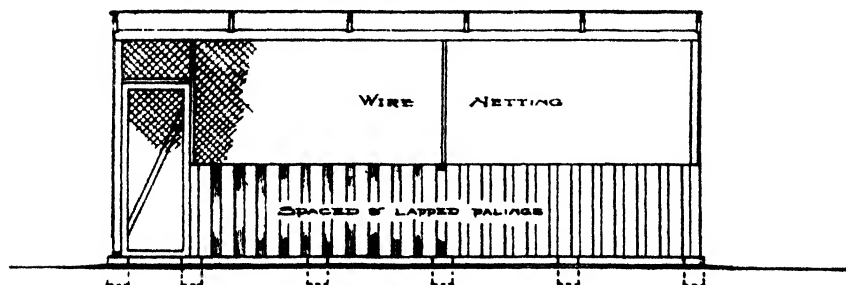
C.—Front Elevation of Single Semi-intensive Poultry House.
